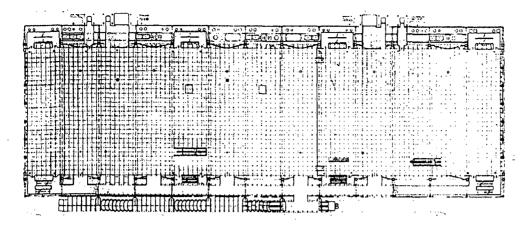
Typical floor plan Renzo Piano and Richard Rogers Pompidou Center, Paris [8]
